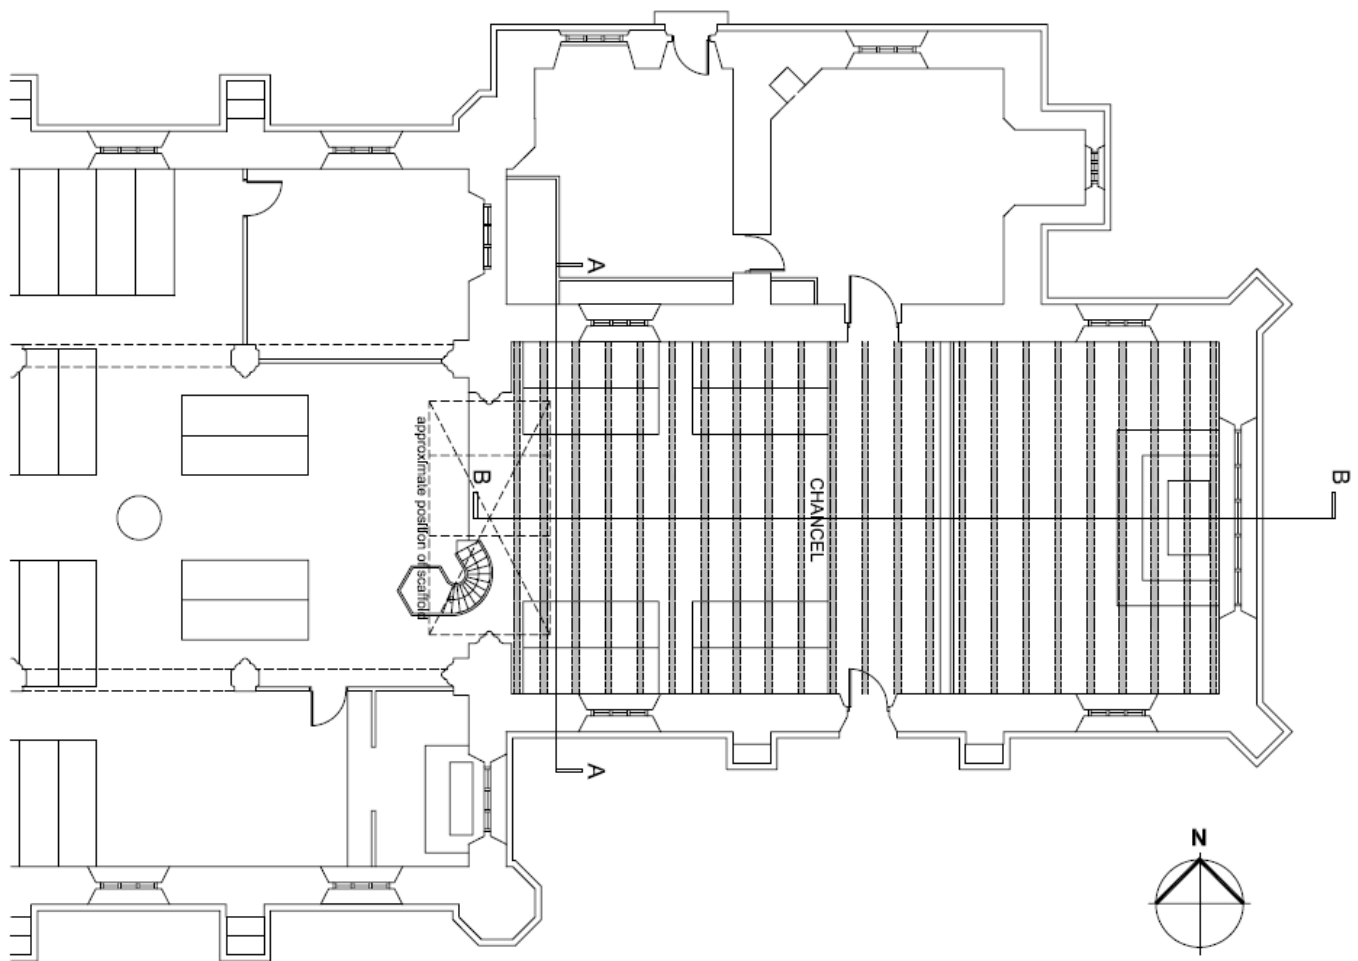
Ground-floor plan, showing the position of sections A–A and B–B (Lloyd Evans Pritchard)
